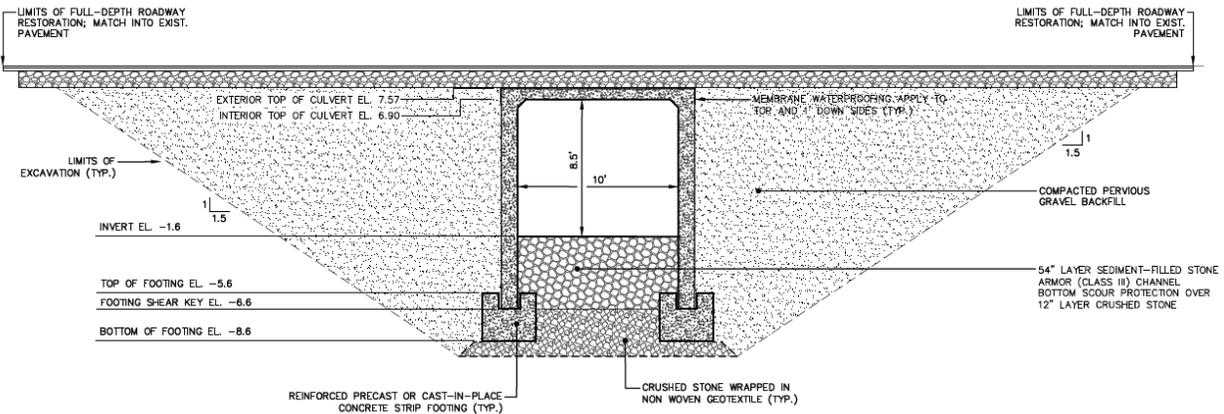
Alternative 1: 10 foot width by 8.5 foot high open bottom culvert.
